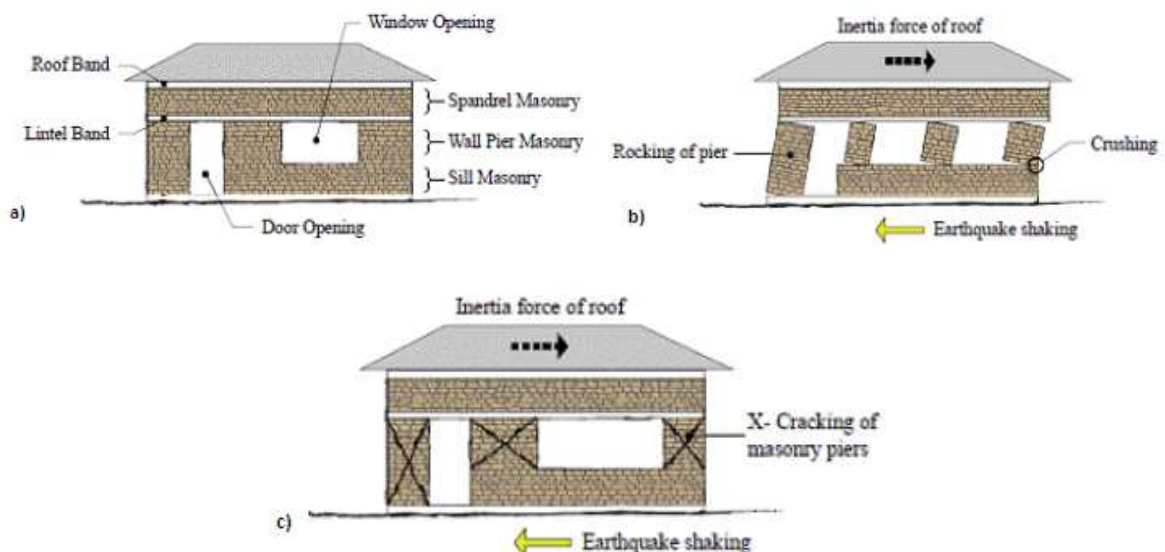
In-plane damage of stone masonry walls: a) typical wall with openings; b) rocking failure, and c) diagonal shear cracking [10]
